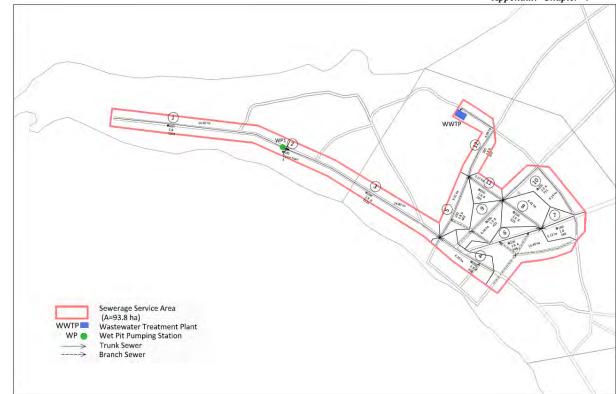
General Layout Plan (Panglao Sewerage System)
